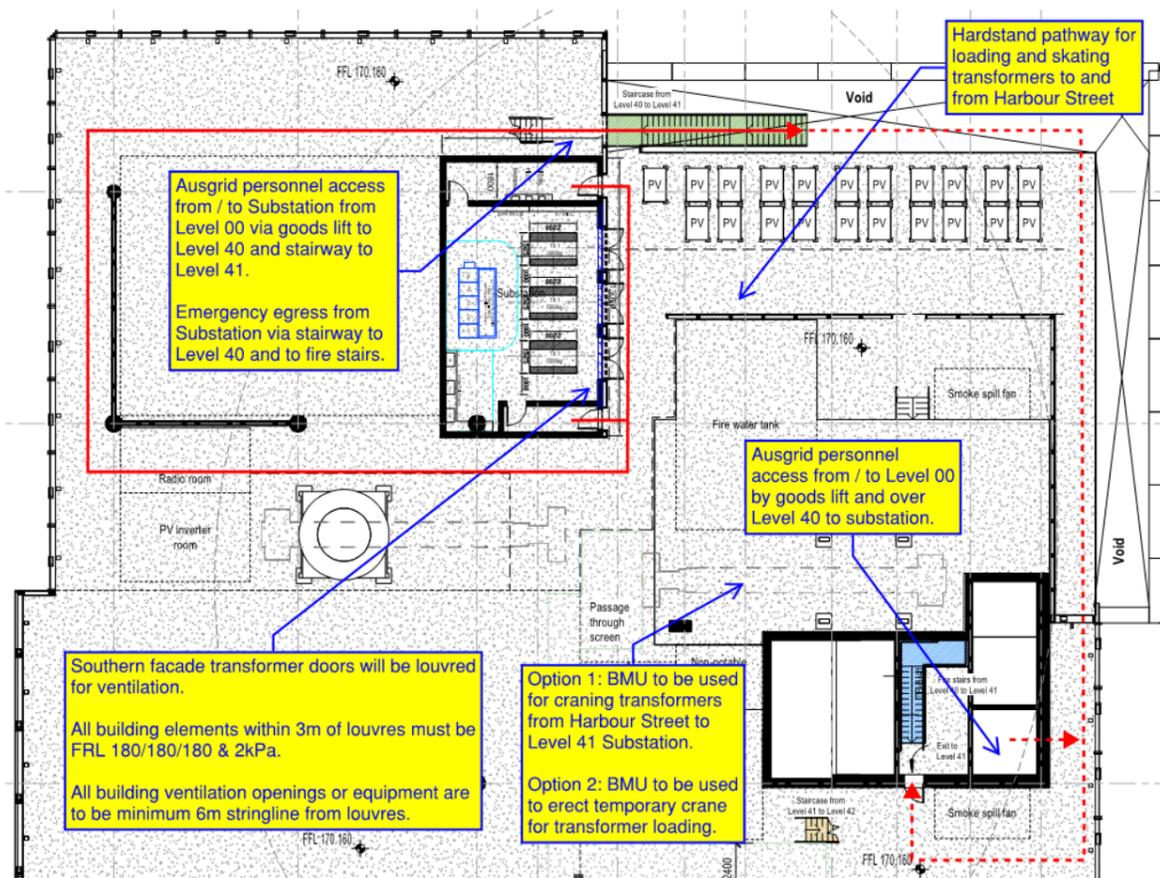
Substation 3 Chamber Location & Spatial Layout, Level 41
